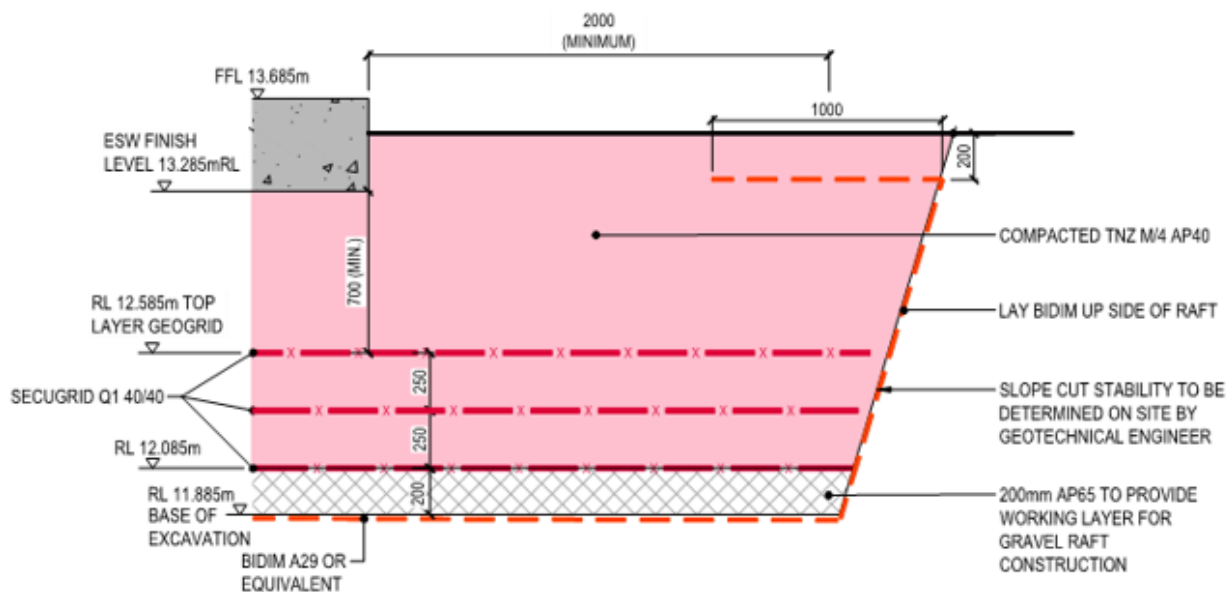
Typical reinforced gravel raft detail at the Redwood Fire Station site.
